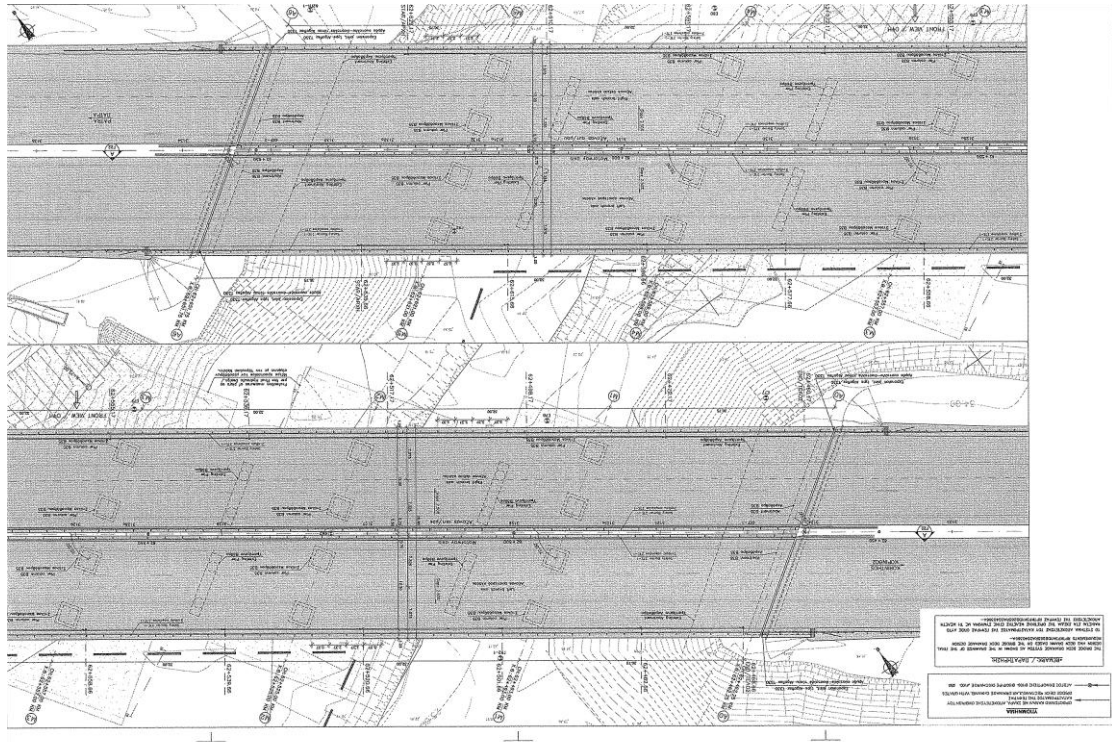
RIVER BRIDGE DECK SLAB FINAL CONCRETE SURFACE (Source: Author's proposal)
